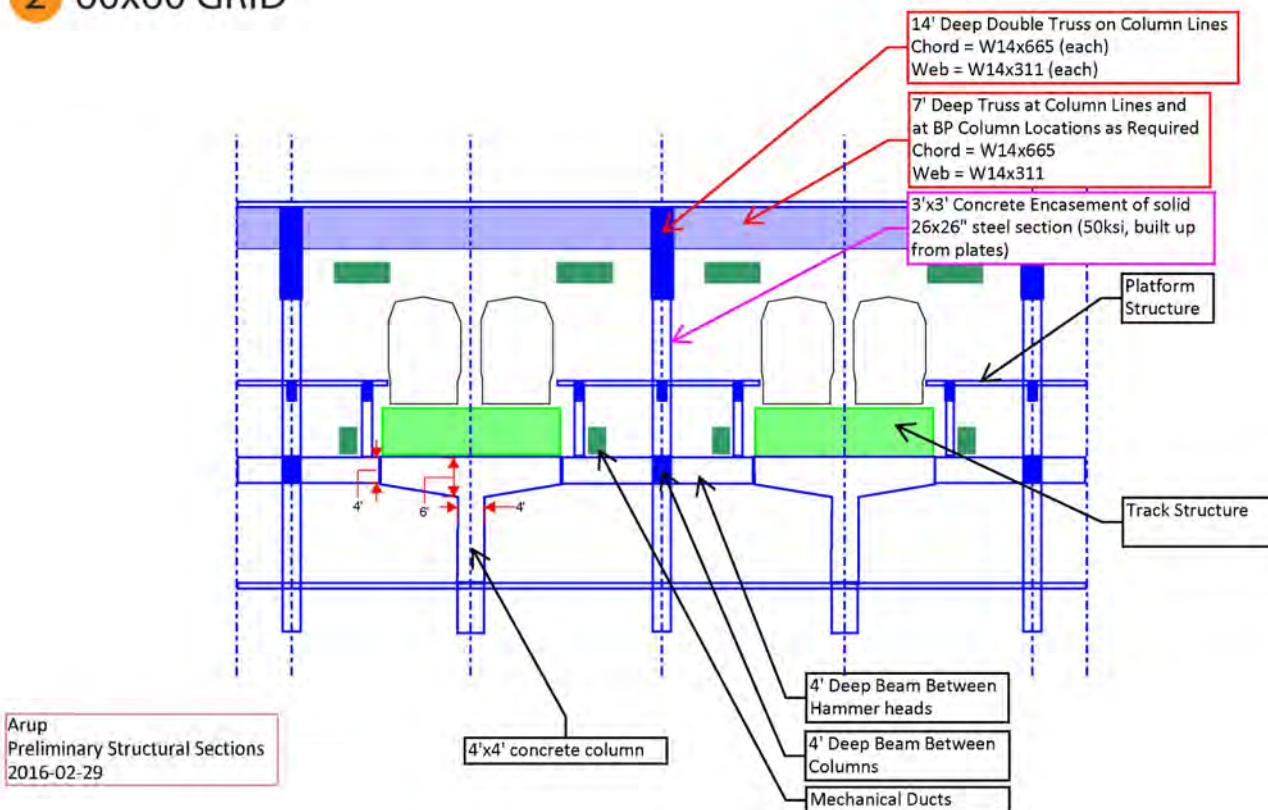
SECTION THROUGH 60x60' GRID ZONE
